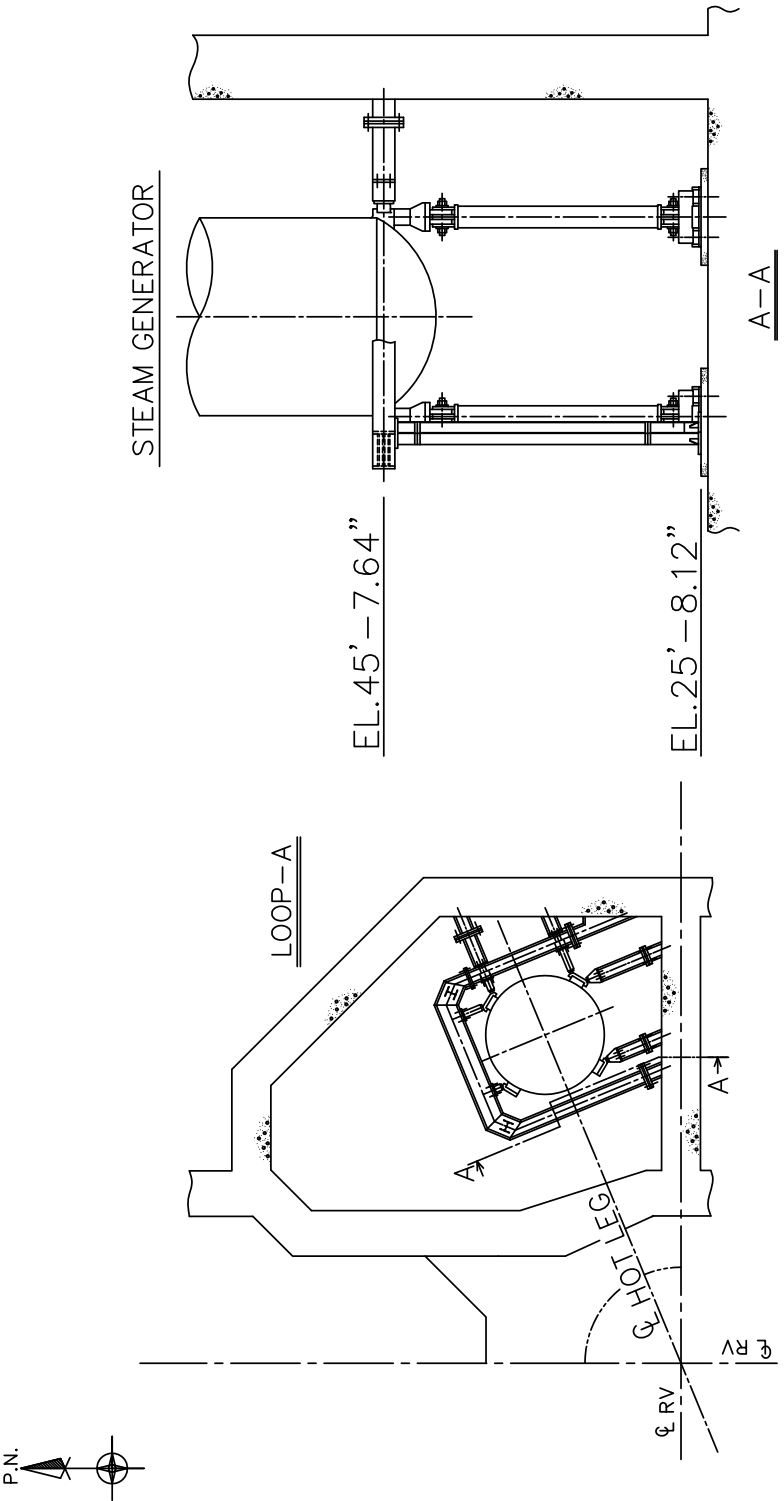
SG Support System (Sheet 3 of 4)
